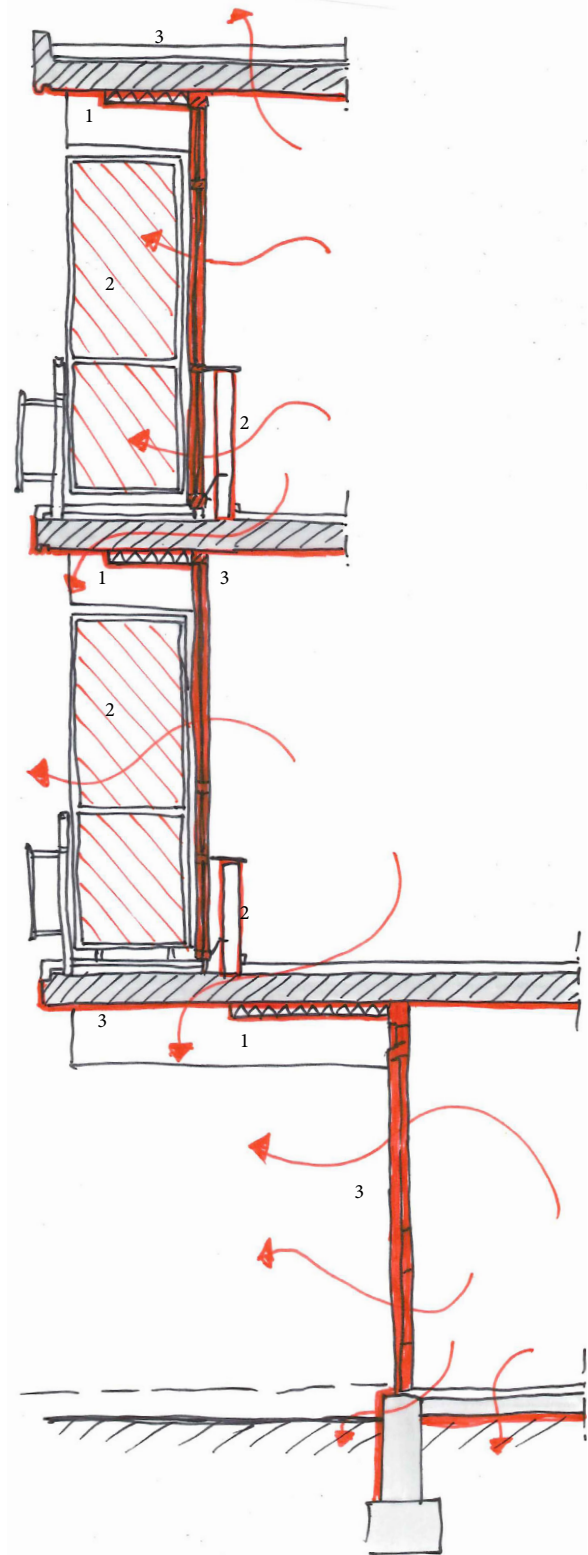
Section of the south façade of the terraced houses in Vrieheide with illustrated problems (own ill.).
